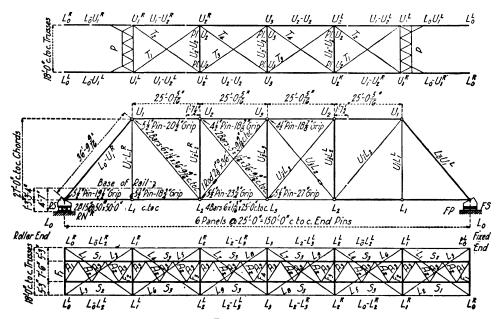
MARKING DIAGRAM FOR TRUSS BRIDGE.
